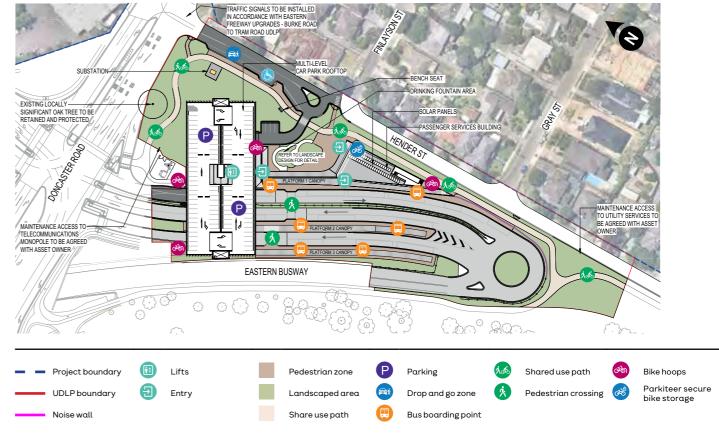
Roof Plan - Parking Layout Indicatively Shown
